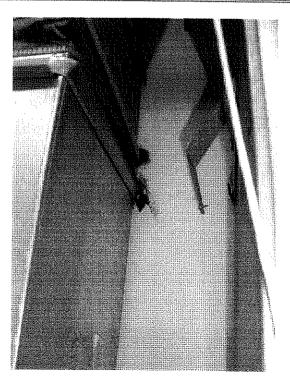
Another view of wall behind ductwork in the mechanical room. Note: Visible fungal growth and debris from inside supply duct that has impacted on the wall.
